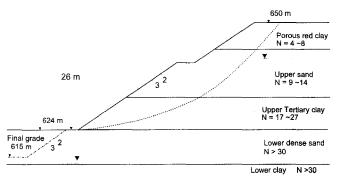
Failure in 26-m-High Slope (Initial Design)
